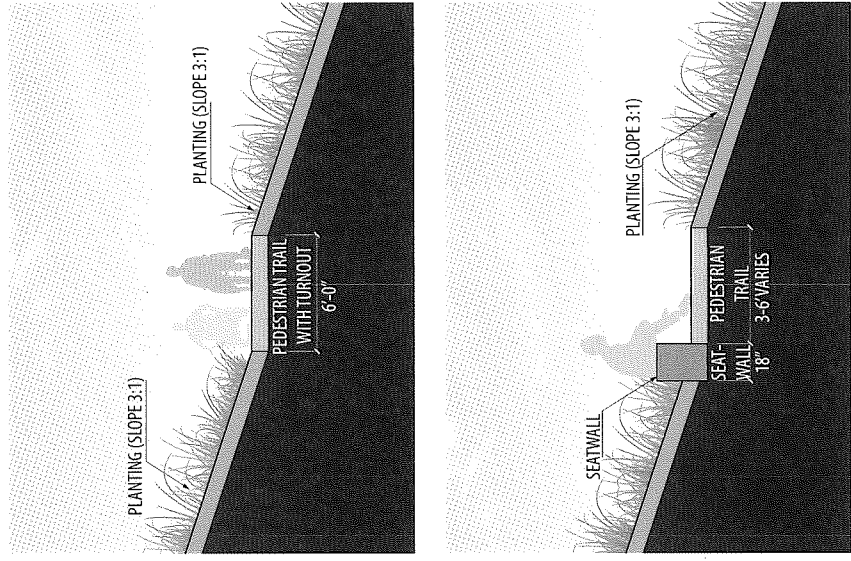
Trail Sections - Type A-D, I: Trail in Slope
